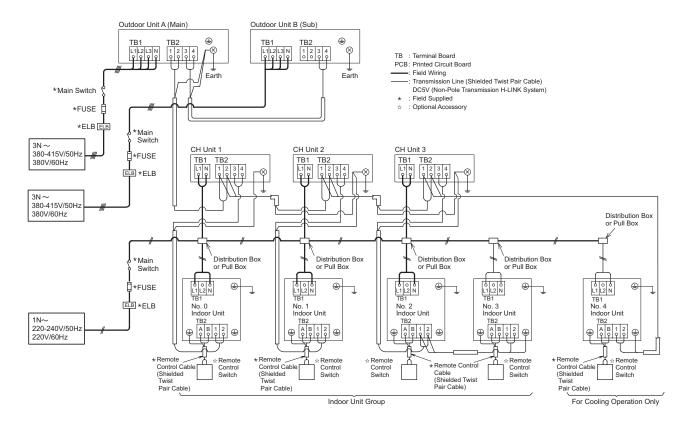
Instruction for Electrical Wiring Connection (Heat Pump System)
